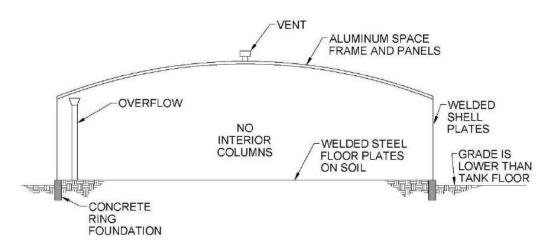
Welded Steel Tank with Aluminum Dome Roof
